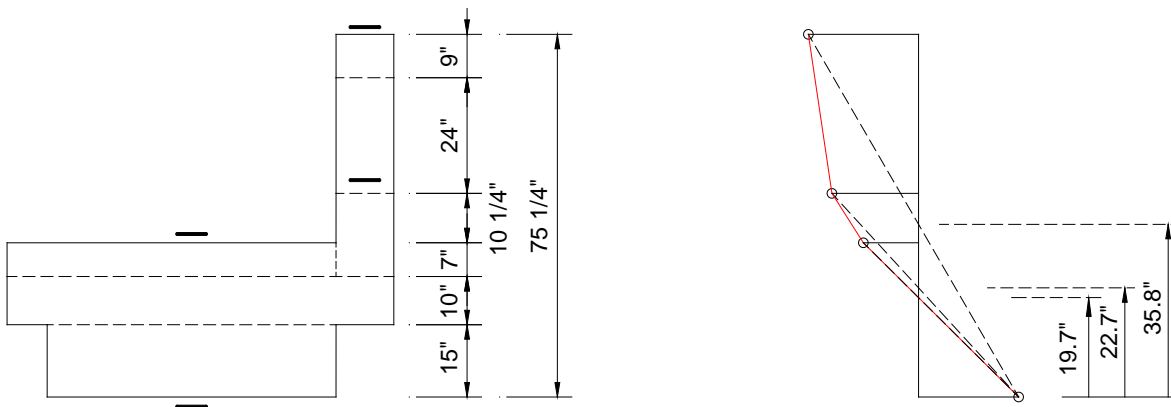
Measured Neutral Axis of Beam 1 Section with Sidewalk and Guardrail.
